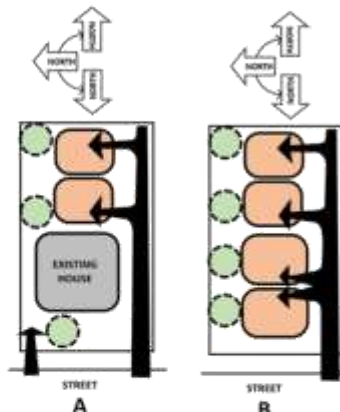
Possible ways to organise dwellings and private open spaces on a site.
